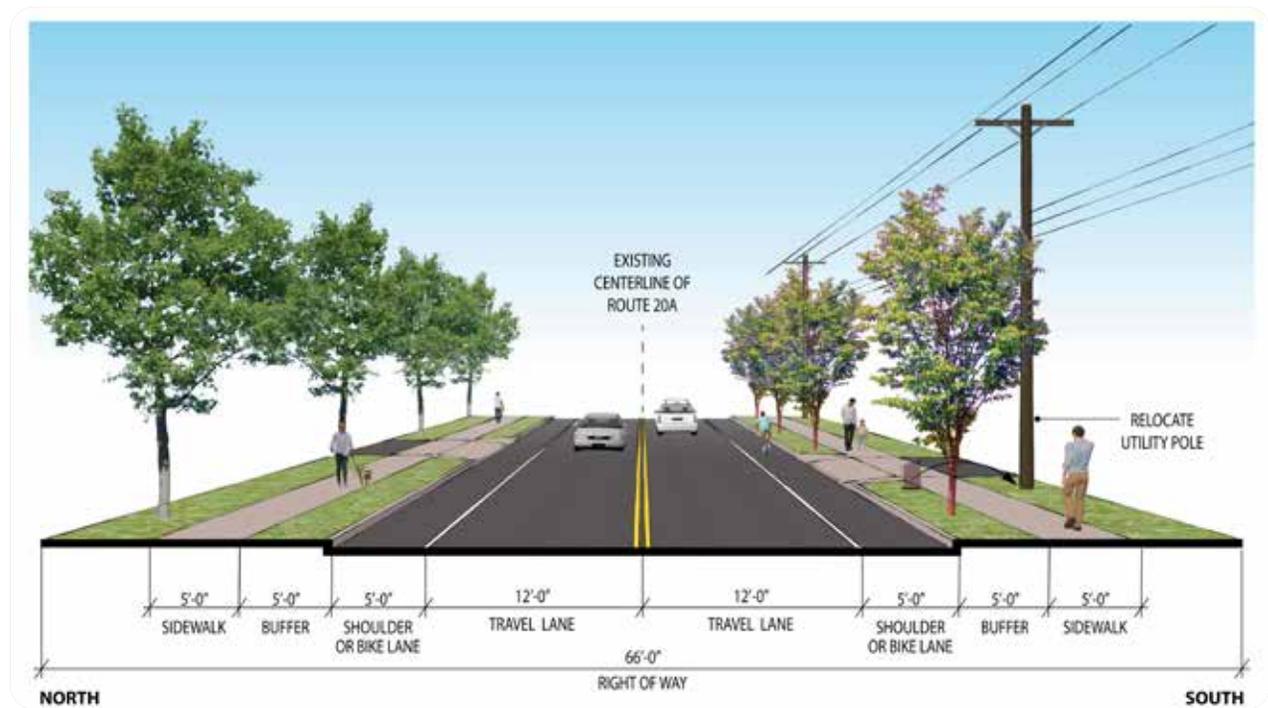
Corridor Project: Rochester Road to East Lake Road and Bronson Hill Road
